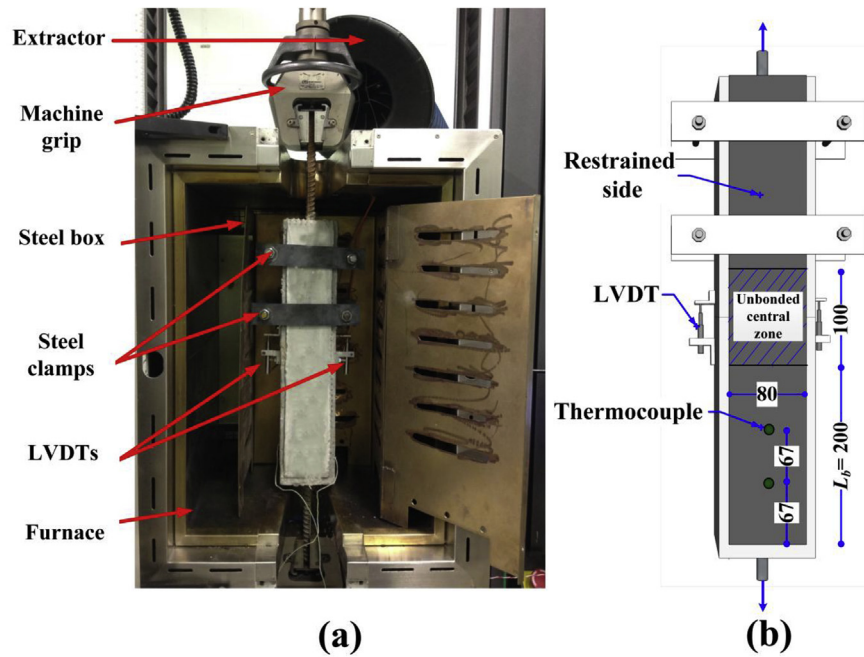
(a) Details of the test setup; (b) details of test specimen.
